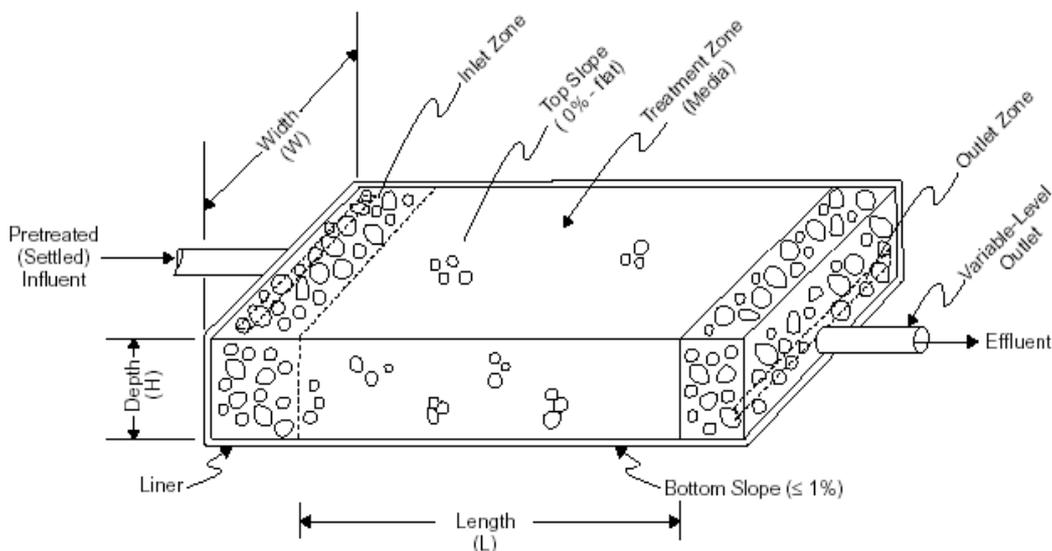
Cross-section design of Constructed Wetland compartment
